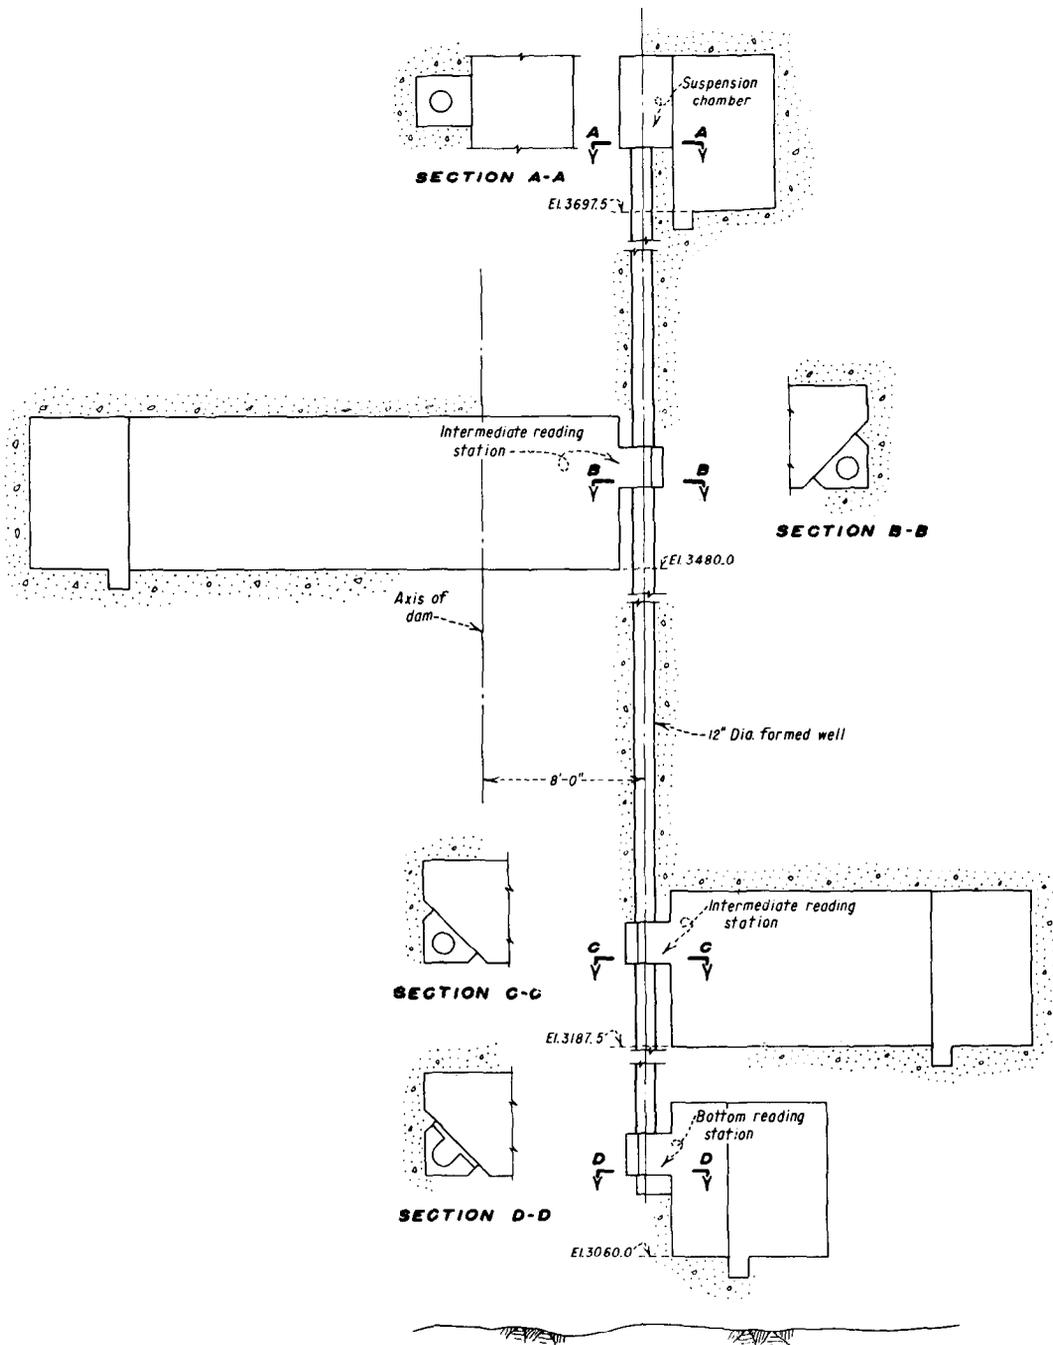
Typical plumbline well in a concrete dam with reading stations at several elevations.—288-D-3090
